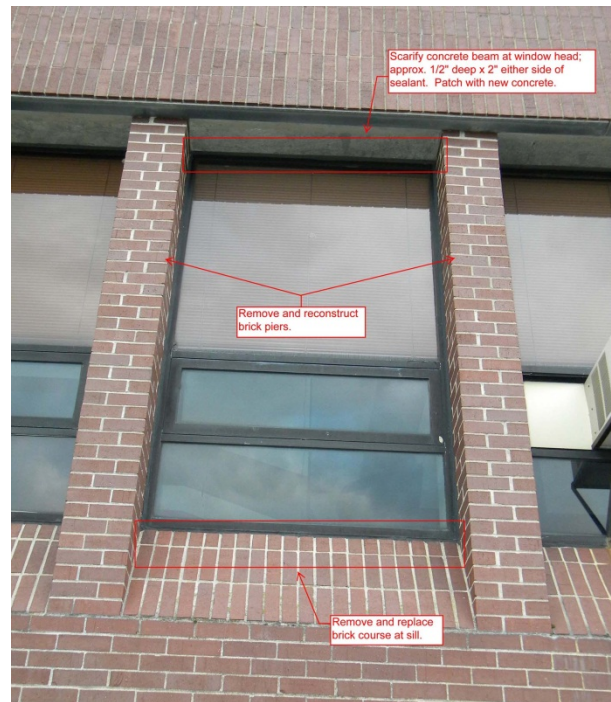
Existing brick jambs and sill and concrete head at typical Type 'B' windows.
